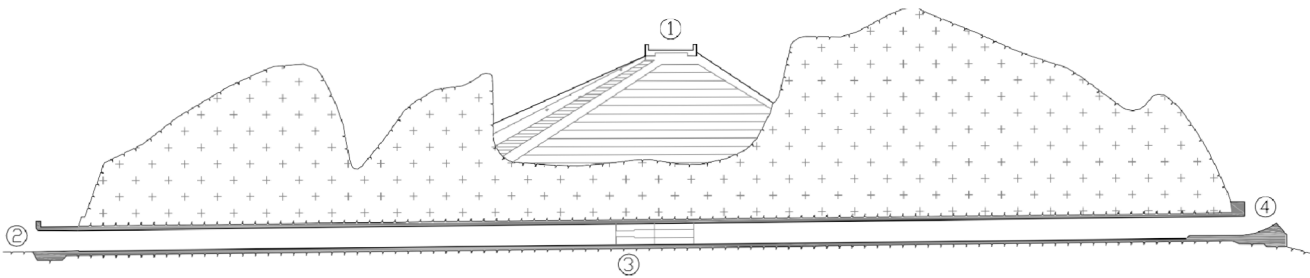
Longitudinal profile of diversion tunnel No. 2. □: dam, —: intake, —: concrete plug, —: flip bucket
